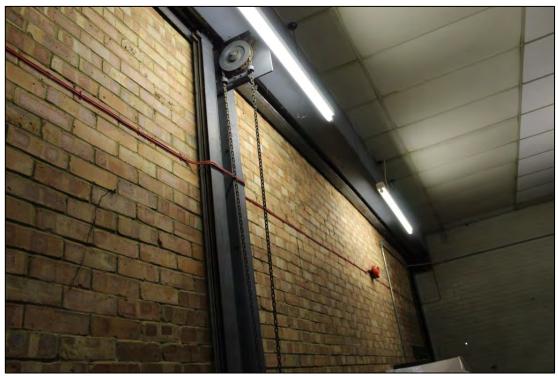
Pulley mechanism and brick infill within southern wall of Room C1
